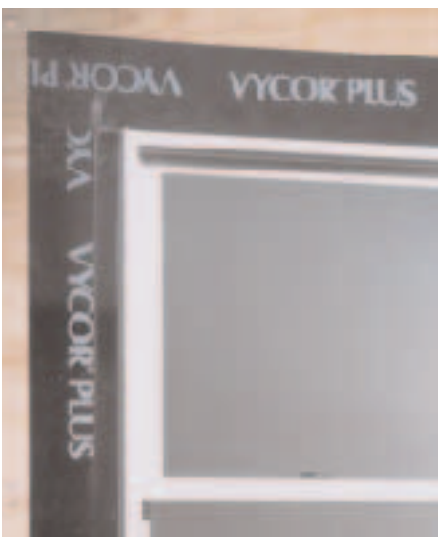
Rubberized-asphalt flashings, like Grace's Vycor Plus, stick well to unpainted plywood. Some manufacturers of rubberized-asphalt flashings warn that adhesion to OSB can be difficult unless the OSB is first primed.
